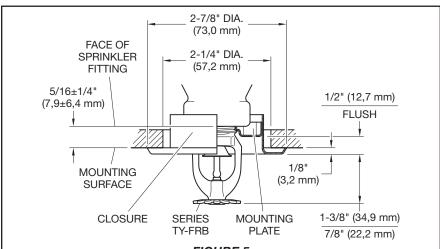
SERIES TY-FRB RECESSED PENDENT SPRINKLER ASSEMBLY (TY323) WITH TWO PIECE 1/2 INCH TOTAL ADJUSTMENT STYLE 20 RECESSED ESCUTCHEON
